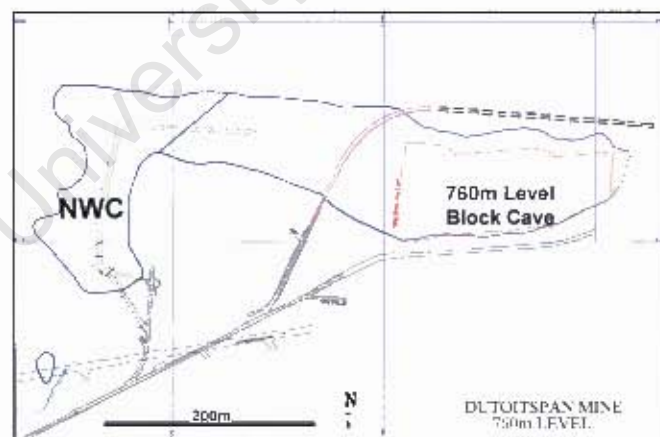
Plan view of Dutoitspan on 760 m Level with sampling tunnel in NWC (figure courtesy of Kimberley Mines Survey Department).
